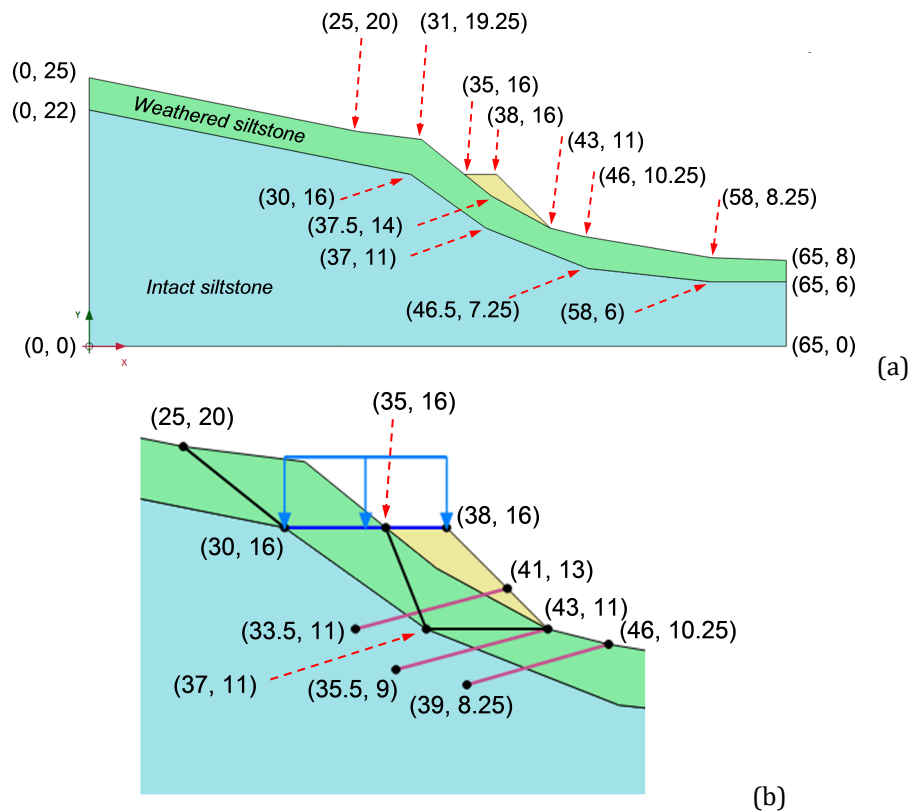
Soil model (a) and position of the road surface, construction details and soil nails (b)
